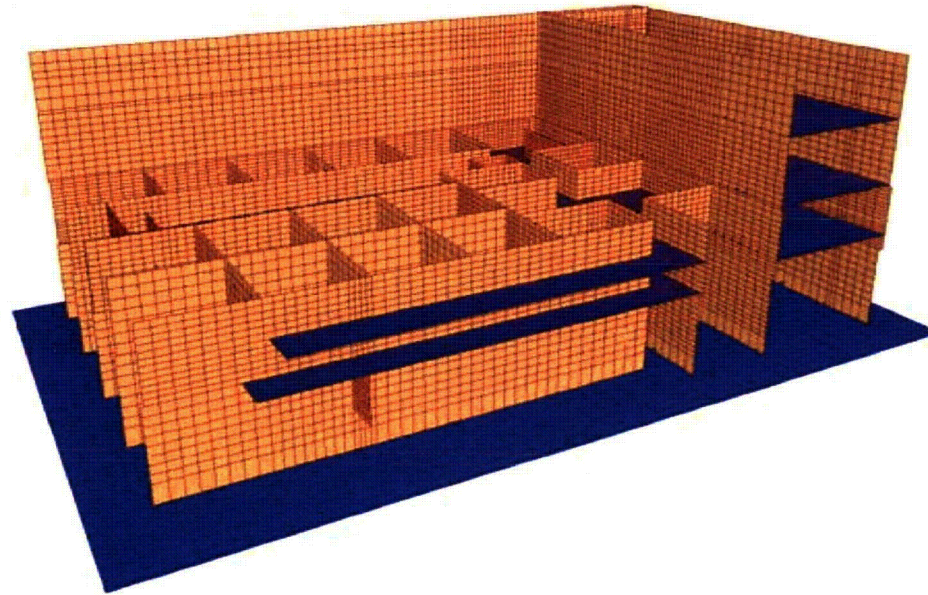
H.3-5 Radwaste Building SAP2000 Model (Looking from Southwest Corner)
